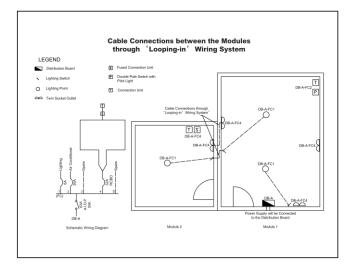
Typical Diagram of Cable Connections between the Modules through "Looping-in" Wiring System
